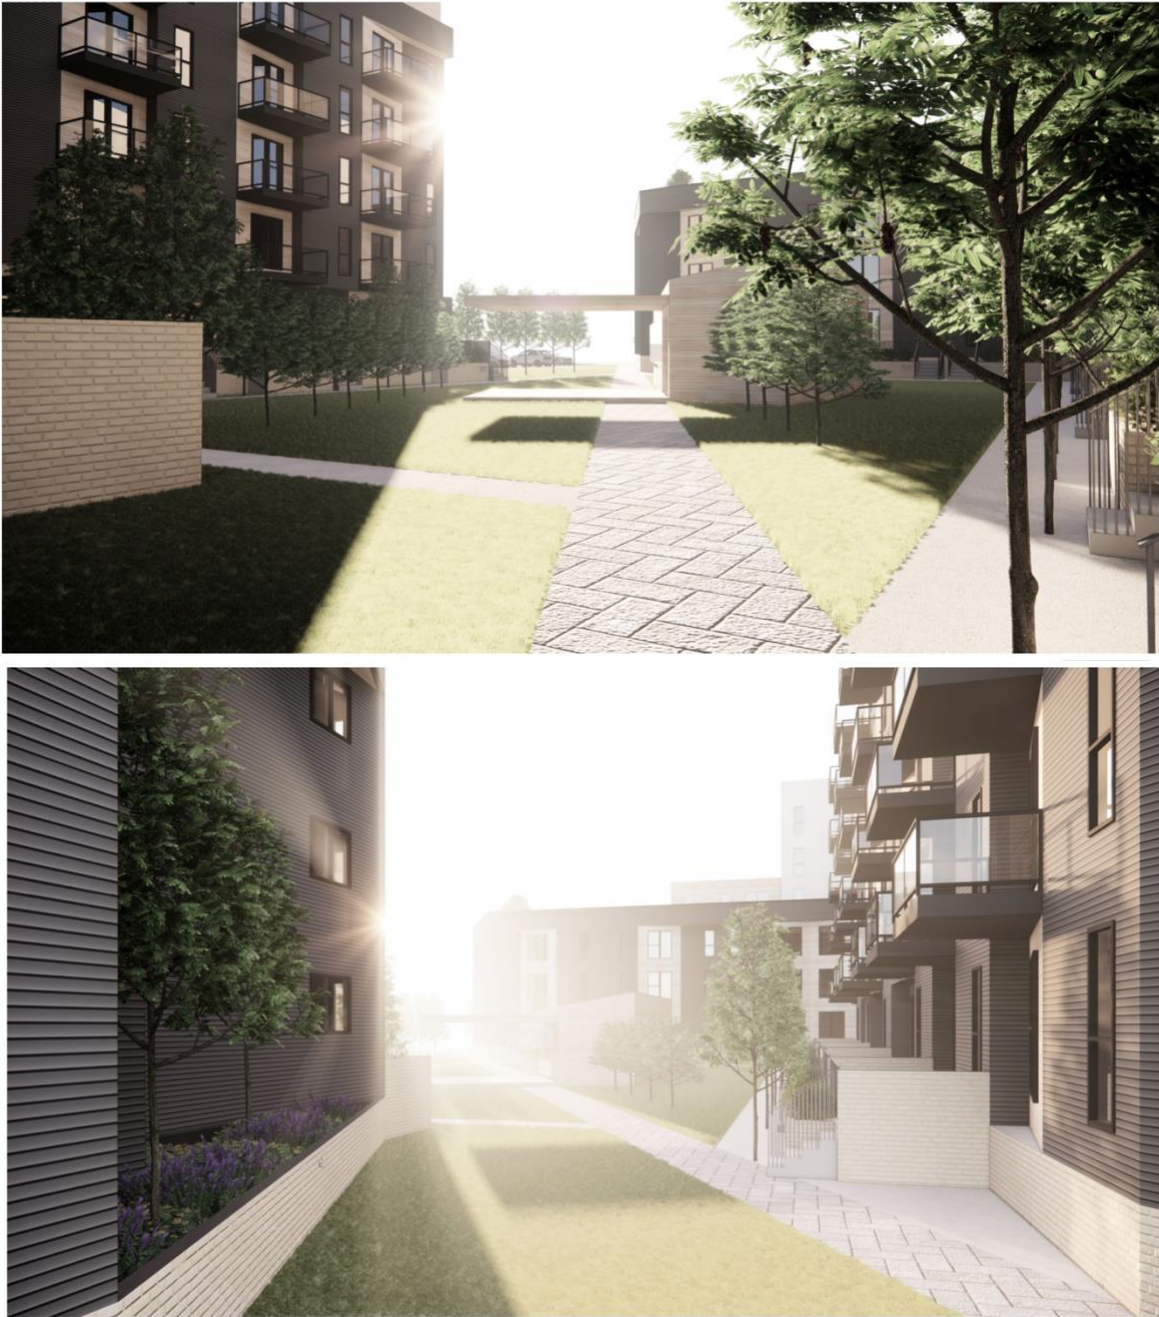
Views of Interior Courtyard and Pedestrian Path – CONCEPTUAL RENDER - (FAAS Architects, Landscape Design by CSW).
